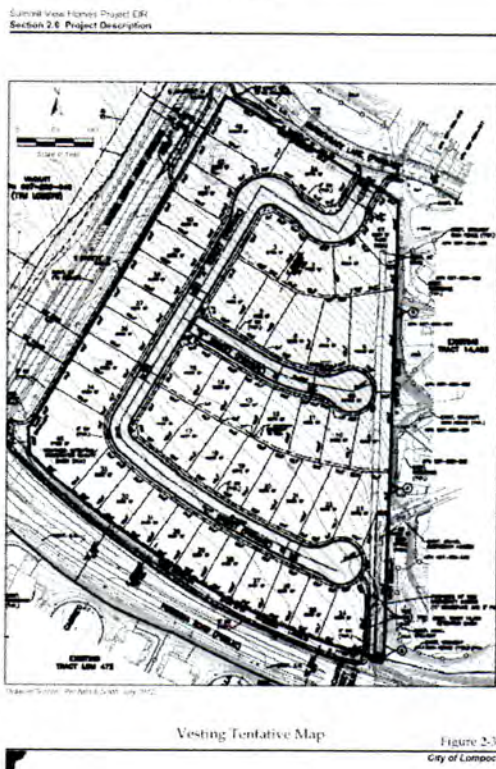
Proposed Summit View Layout (Source: EIR Figure 2-3)
